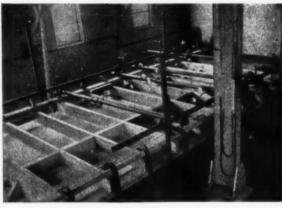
Rig for static loading tests. (Floor section is inverted, with captive airbag beneath for loading.)
